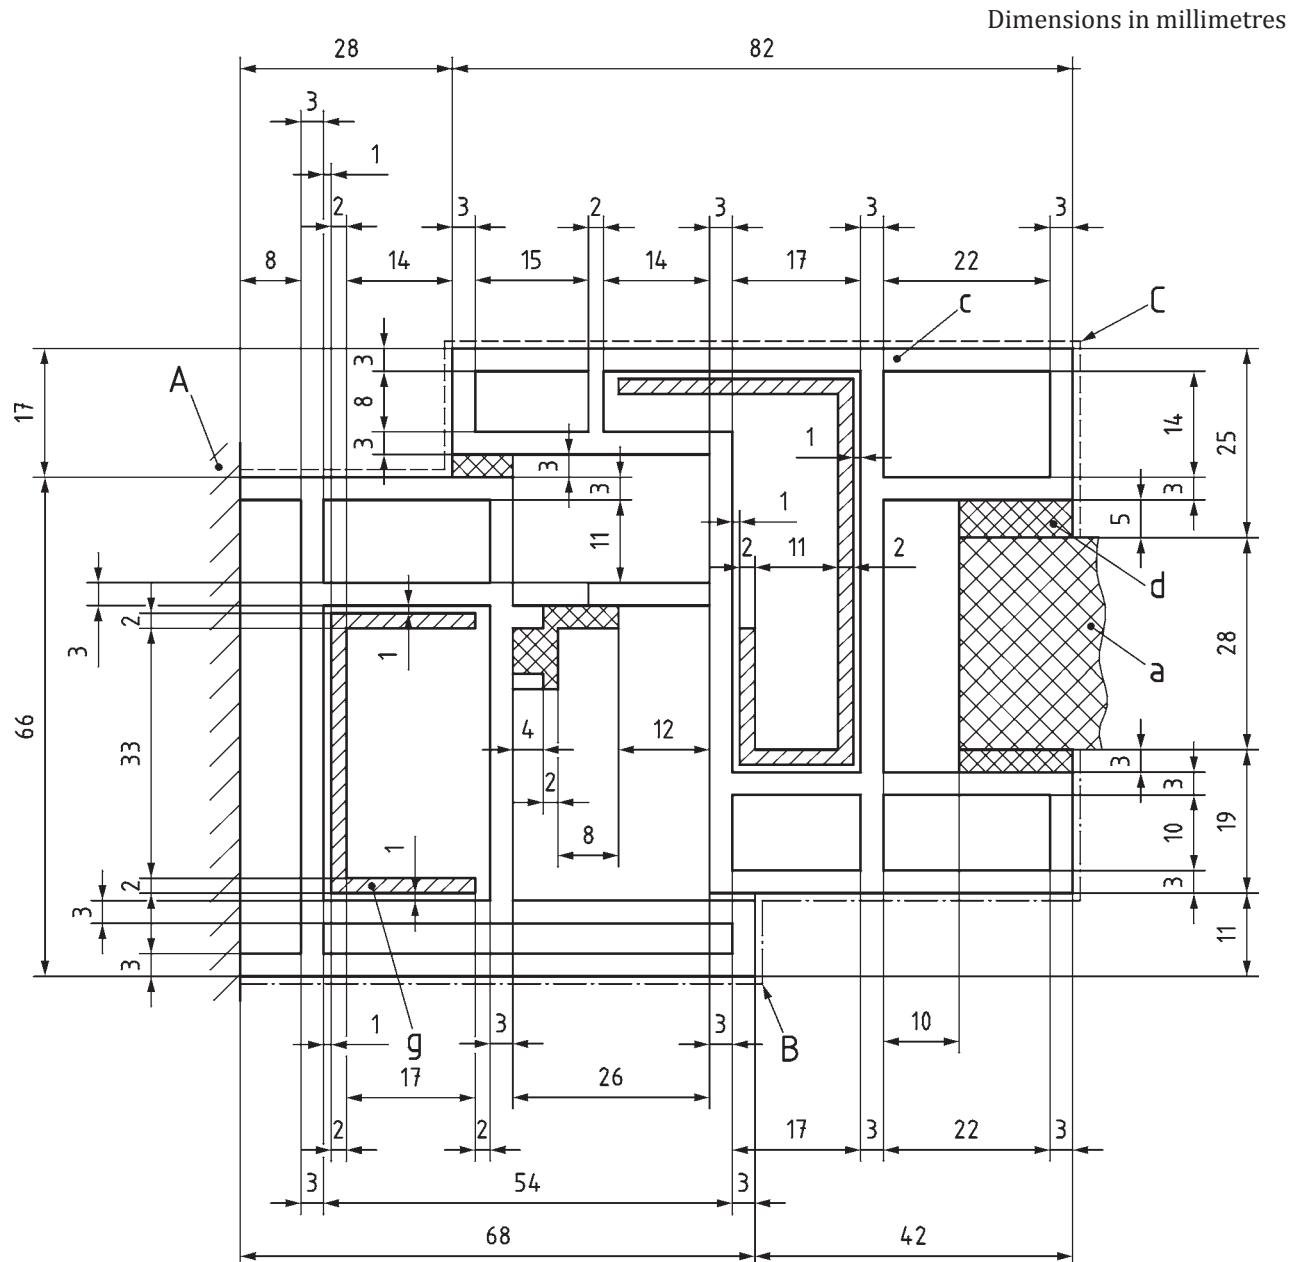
Aluminium frame section with thermal break and insulation panel
